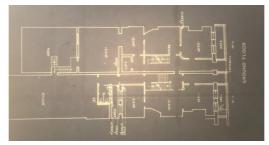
1965 Drainage Plan showing ground floor layout of nos. 14 & 15 Greats James Street
